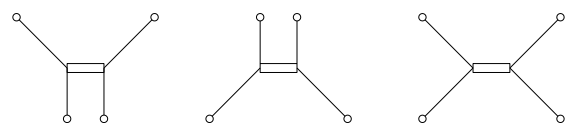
Suspension bridge stabilization in horizontal plane by cambering of main or stabilization cables. Cross-sectional view
